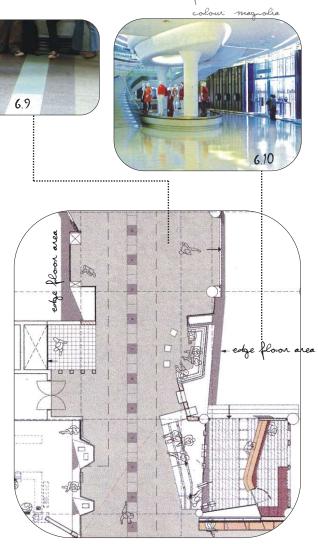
Detail of ground floor indicating the EDGE FLOOR AREA
